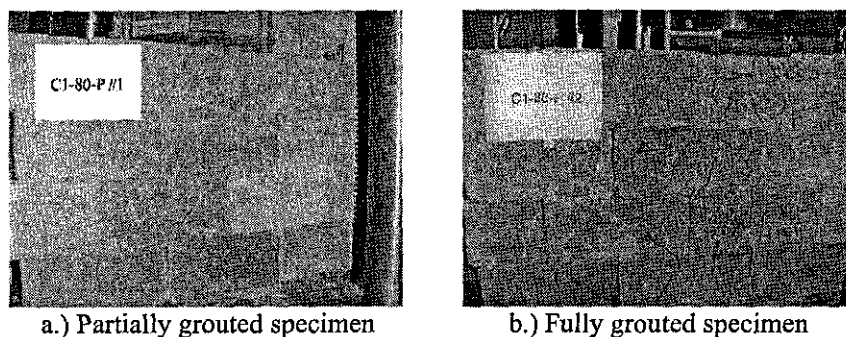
Cracks in the test specimens due to concentrated axial loads
